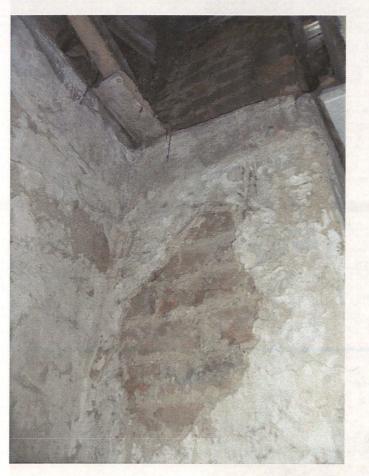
Interior of Room 1b, detail of chimney showing exposed brickwork, looking west
